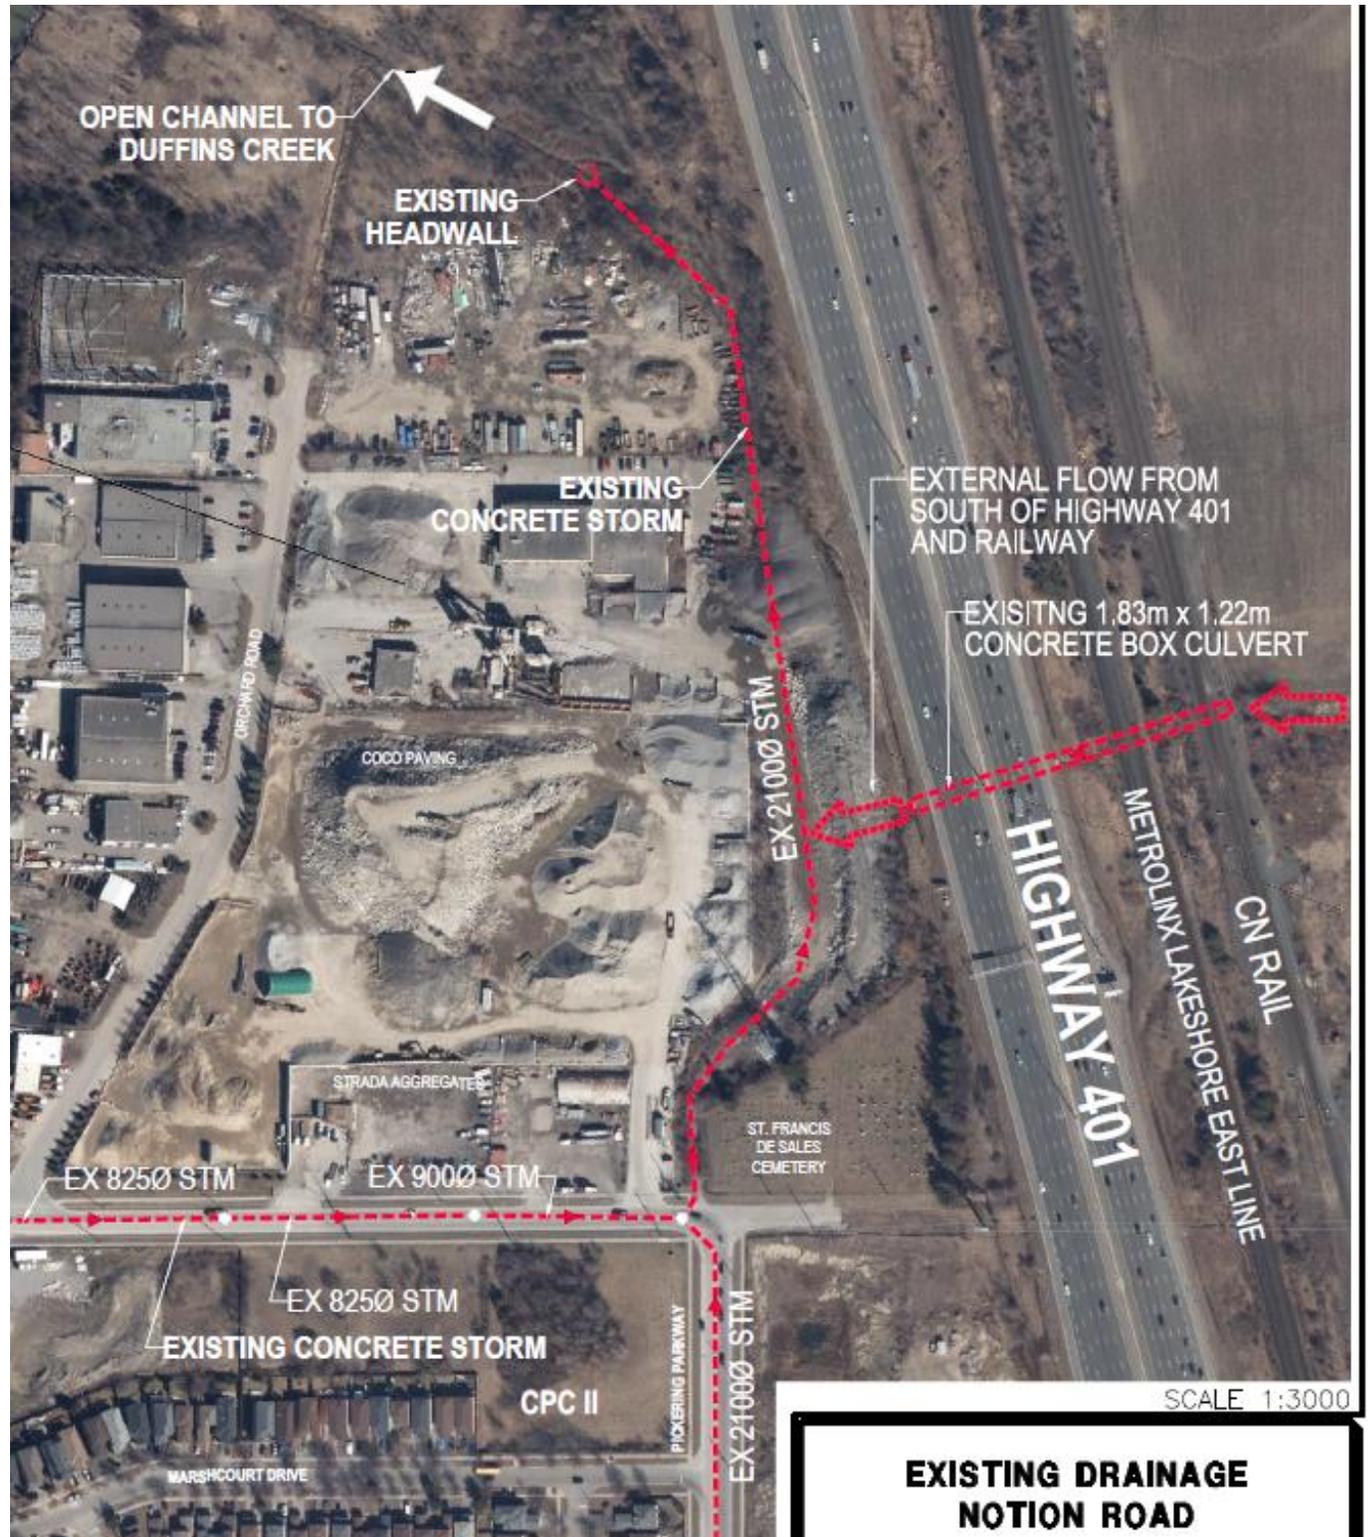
City layout of existing Storm sewers and Site sewers
